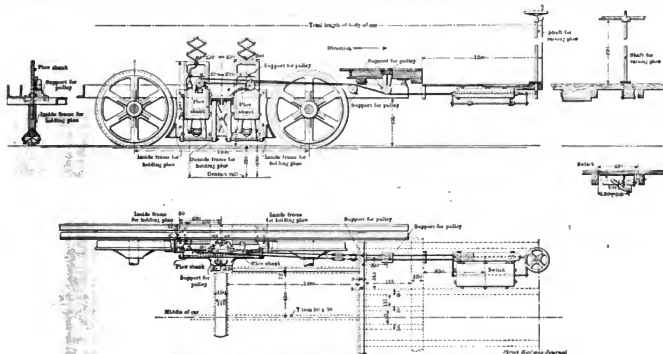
SIDE ELEVATION, CROSS SECTION AND PLAN OF PLOW
